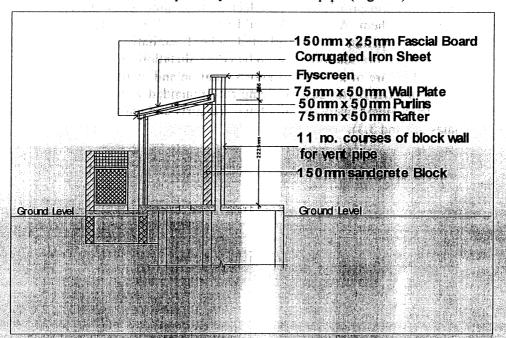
Cross Section of the VIP latrine showing details of the roof structure
